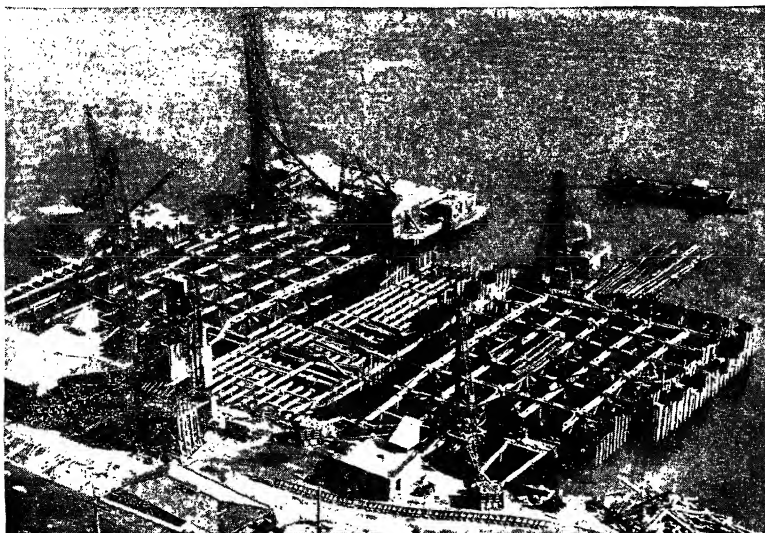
Deep cofferdam for George Washington Bridge pier.
